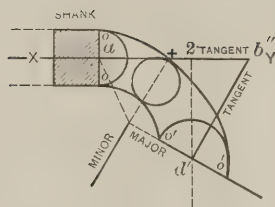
Face Mold for the Acute Plan of Wreath in One Piece Shown in Fig. 91.
